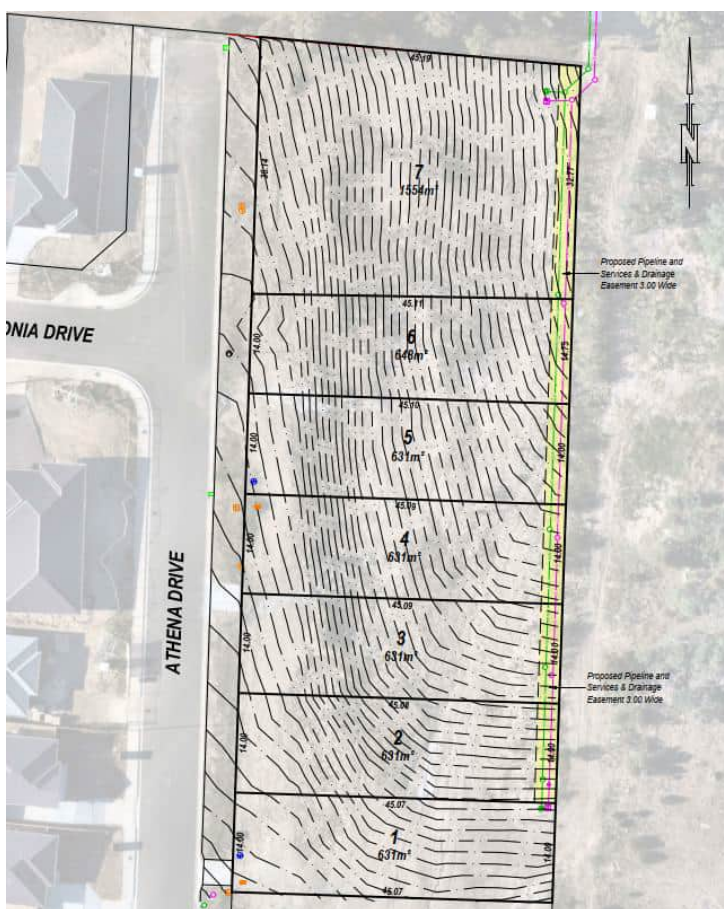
Proposed Subdivision Layout dated 11 July 25.
